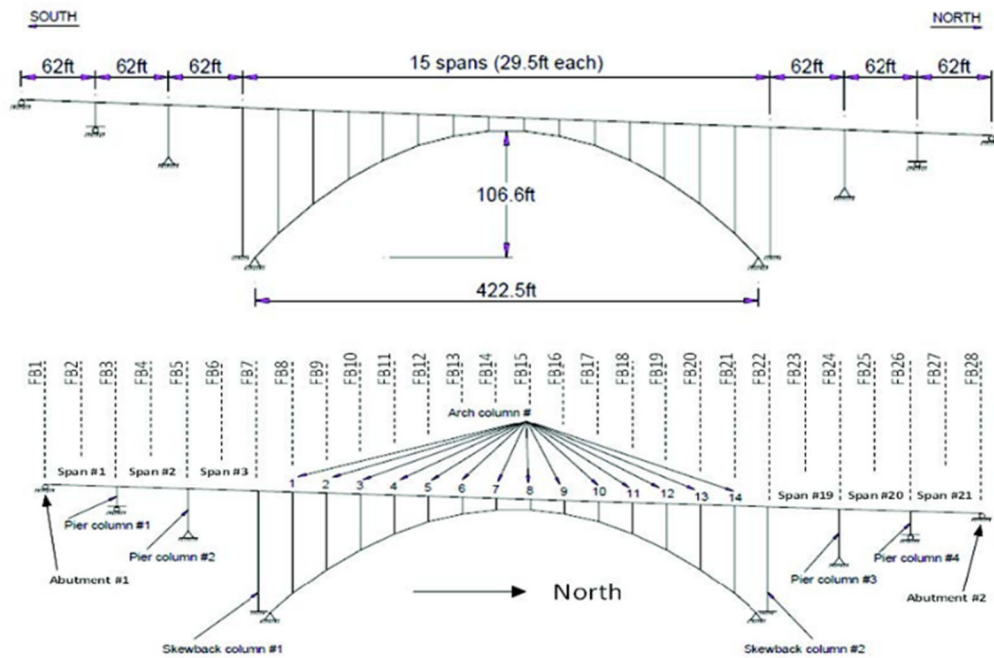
Elevation view of the Los Alamos Canyon Bridge.
